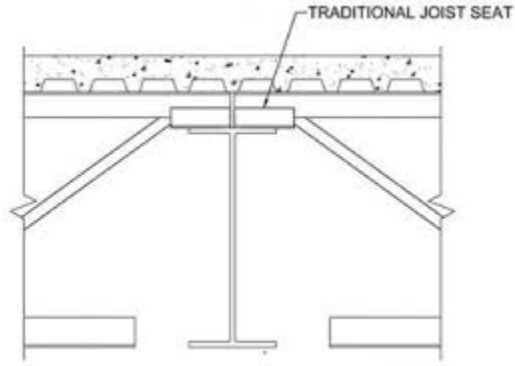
Typical Bearing Seat Joist Connection (Murray and Davis 2020)
